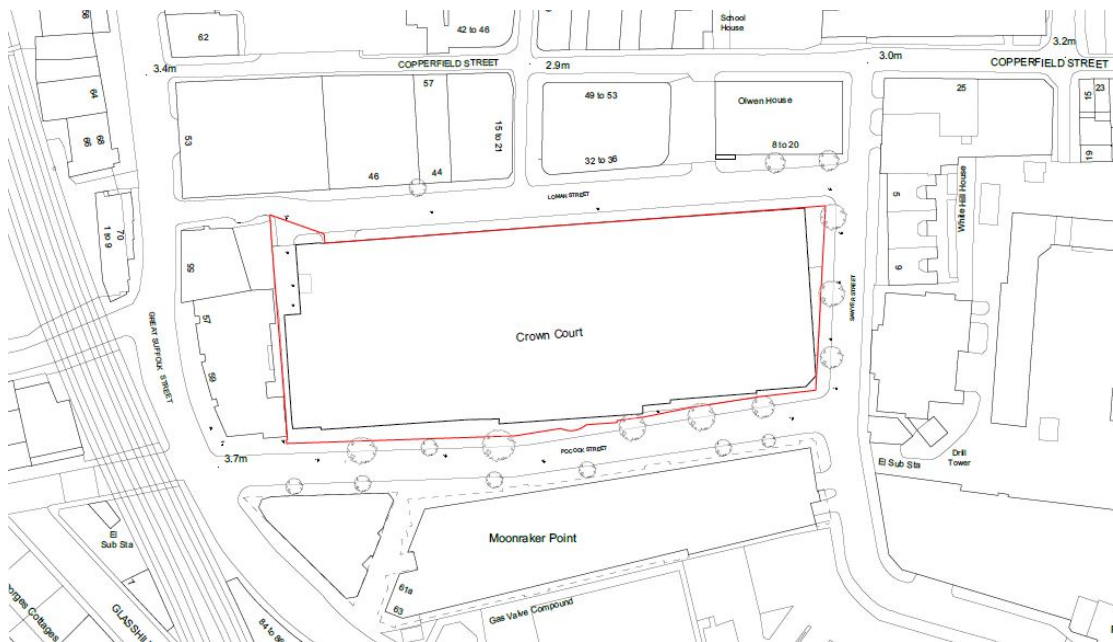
(above): Site location plan, showing the site boundary edged in red.
